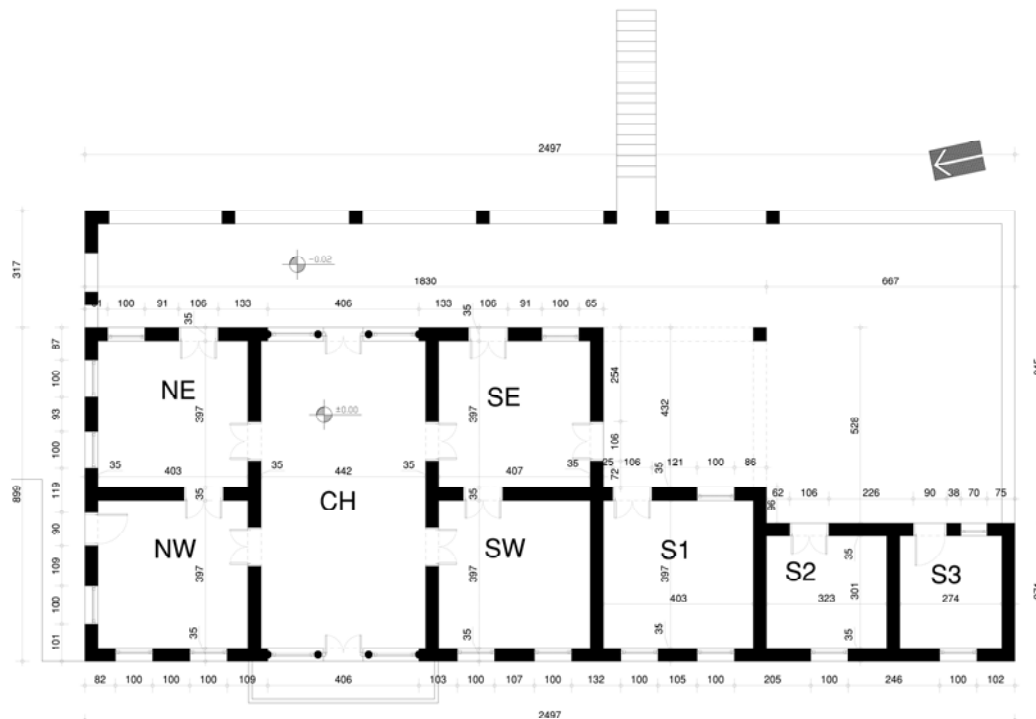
living floor plan of the house at 35 Israel Me-Salant Street, Tel-Aviv-Jaffa (redrawn by the author based on existing documentation)
